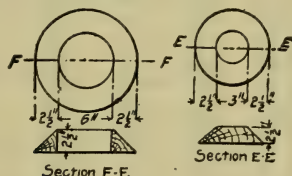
Forms for constructing openings for the entrance of circular ducts into concrete vaults.
